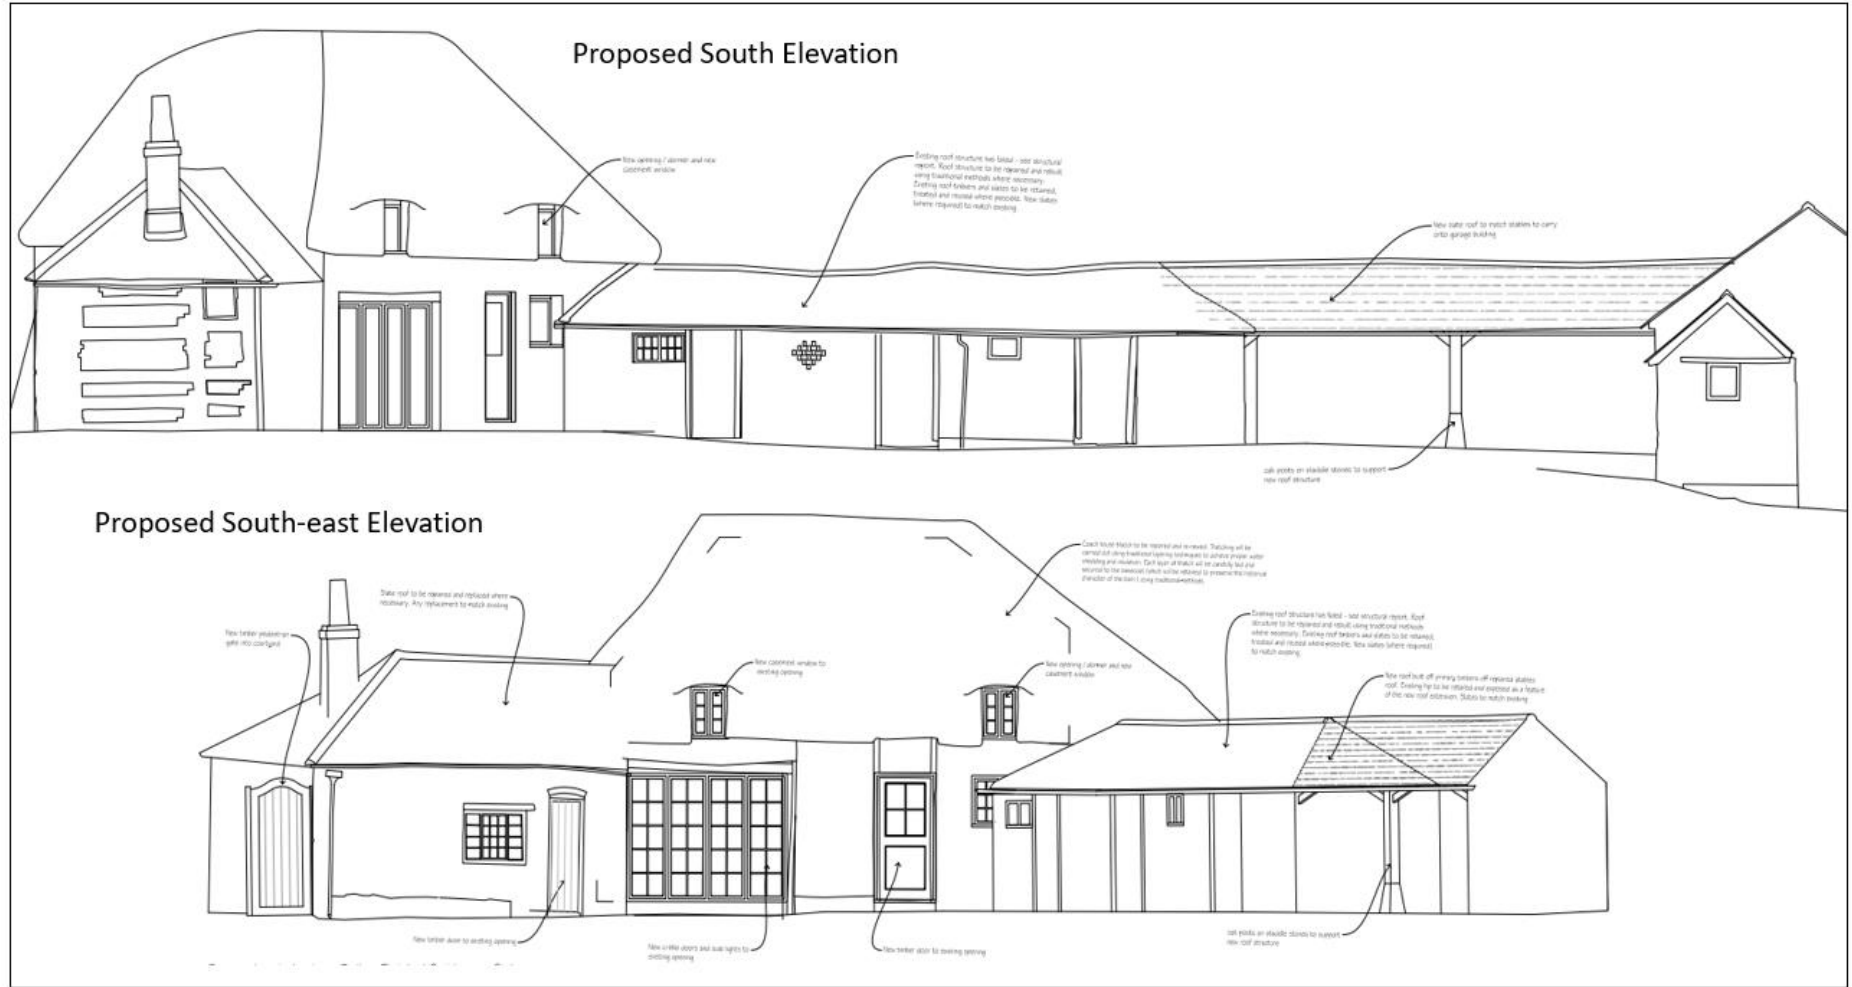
Proposed south and South-east elevations of the converted outbuildings at Bec House (Fowler Architecture and Planning).
